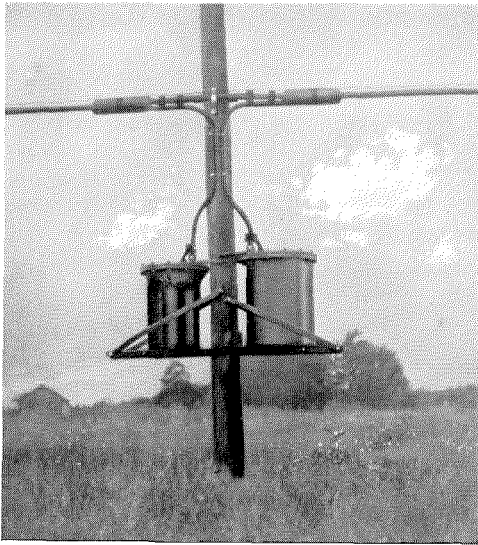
Installation of Aerial Toll Cable Loading—Single Pole Fixture for Small Branch Cables
